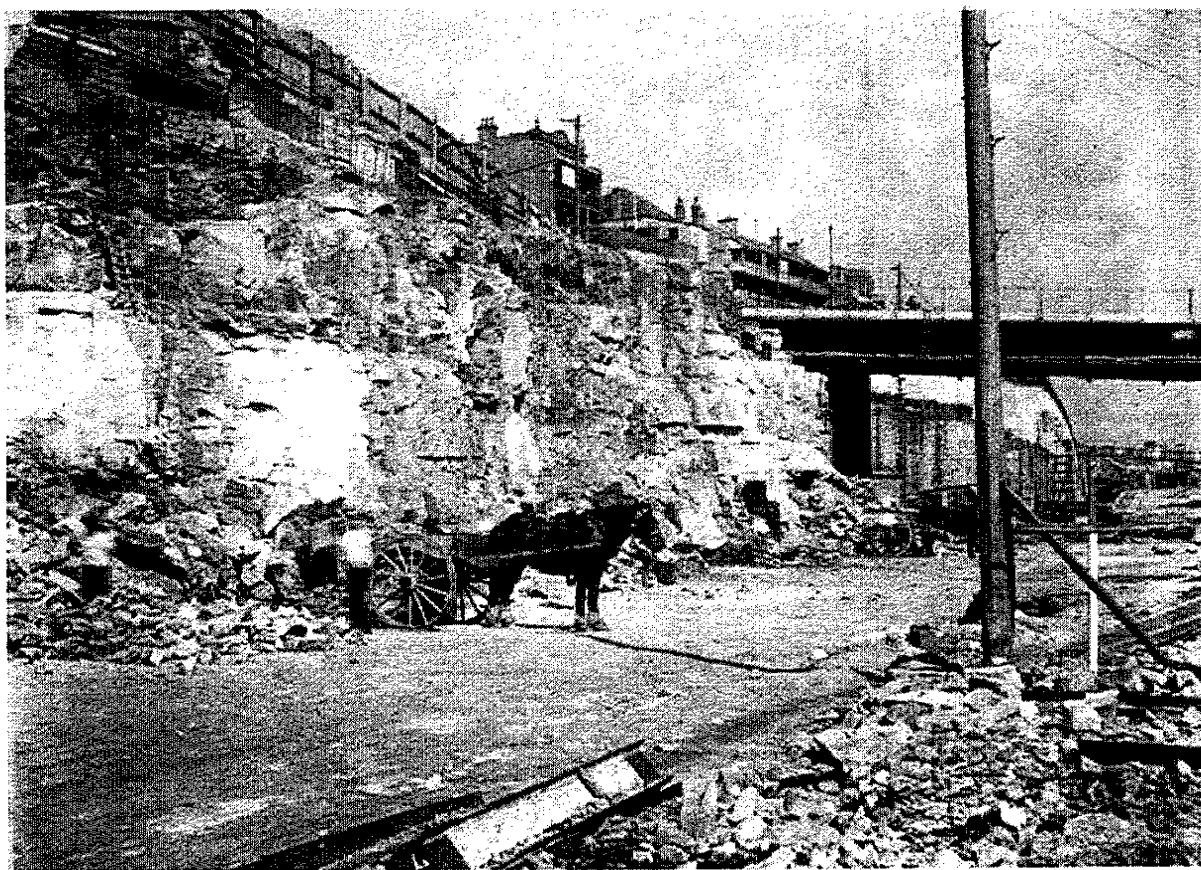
Excavation for new roadway behind Jones Bay Wharf with bridge from Bayview Street in background 1919. Source: ML GPO 1-21100.
